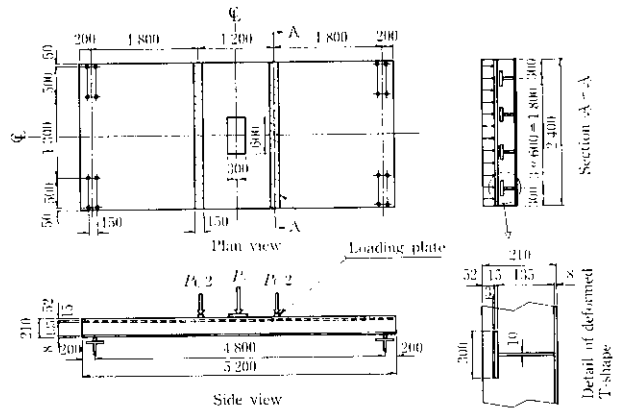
Dimensions and loading arrangement of specimen for fatigue test
